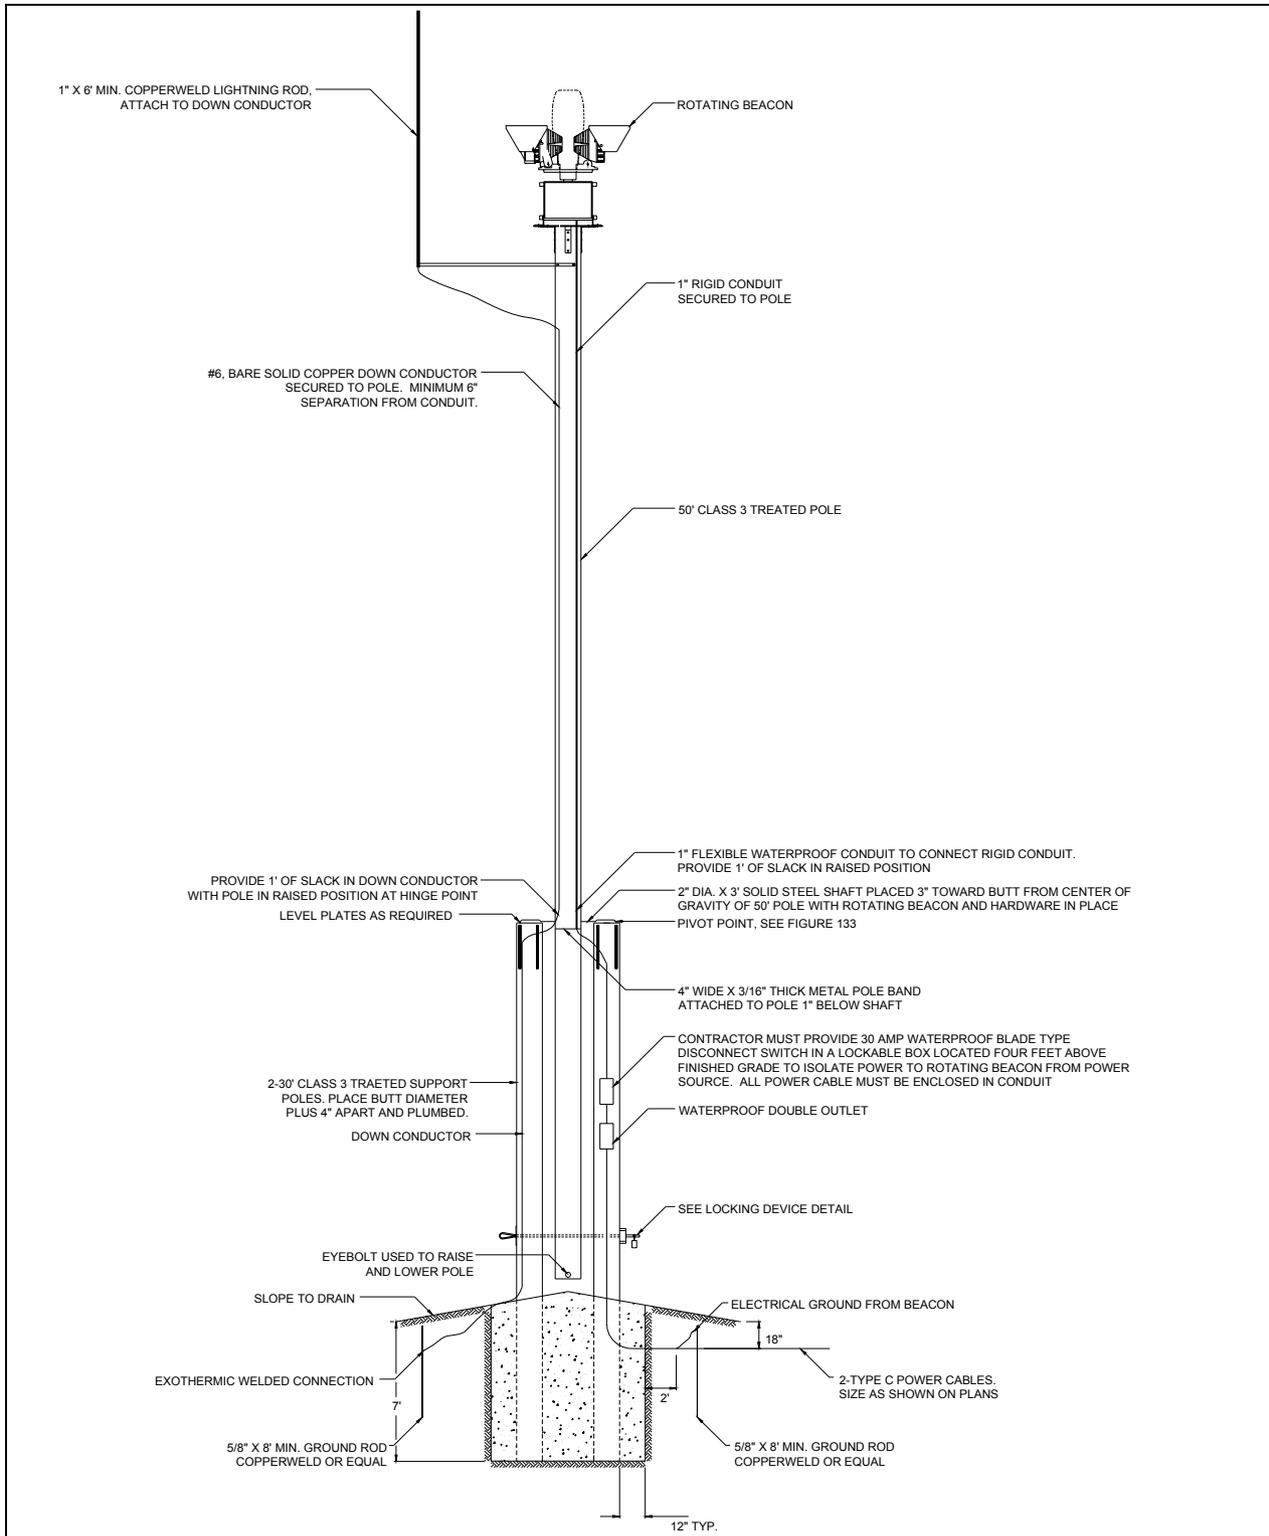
Standard Details for Pivoting Rotating Beacon Pole
